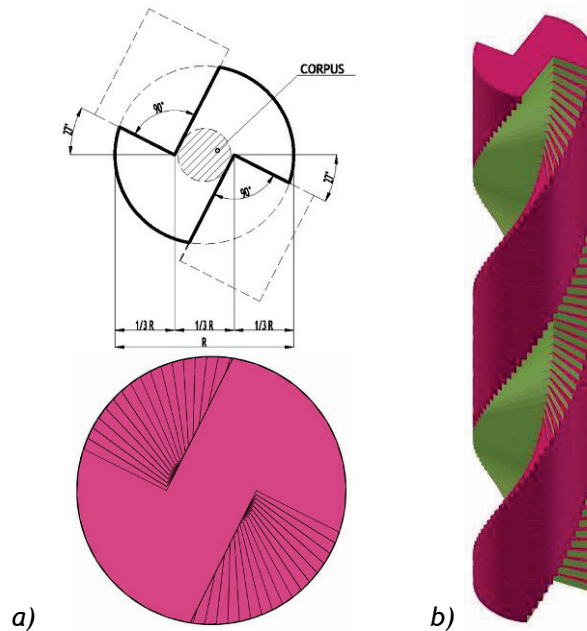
Structure No.1: a) Floor plan; top view b)3D model
